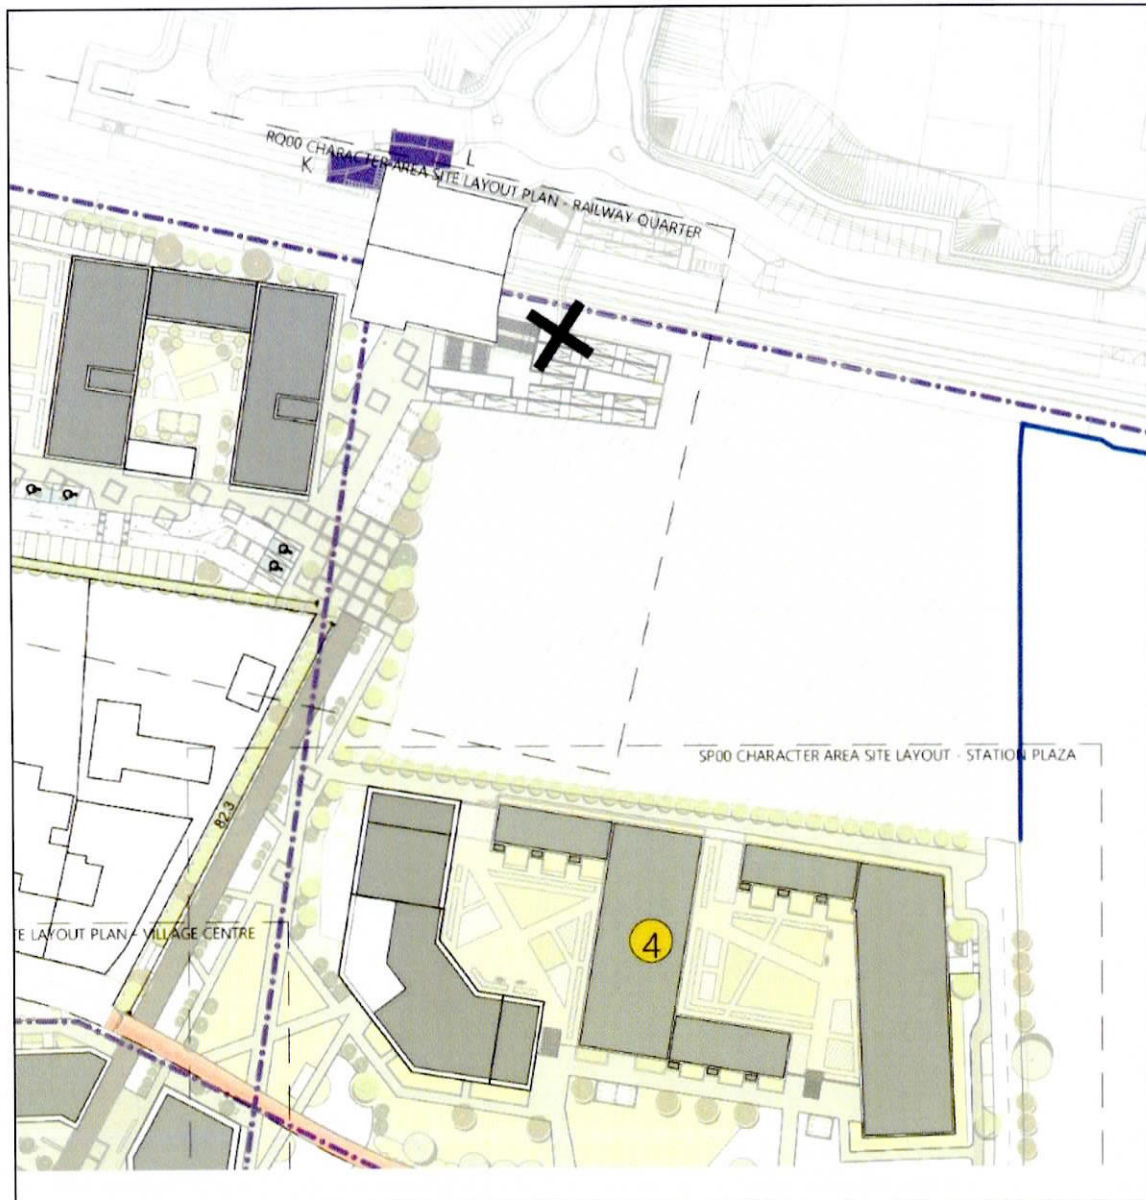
Proposed access ramp at Hansfield Station as part of Barnhill Garden Village SHD
